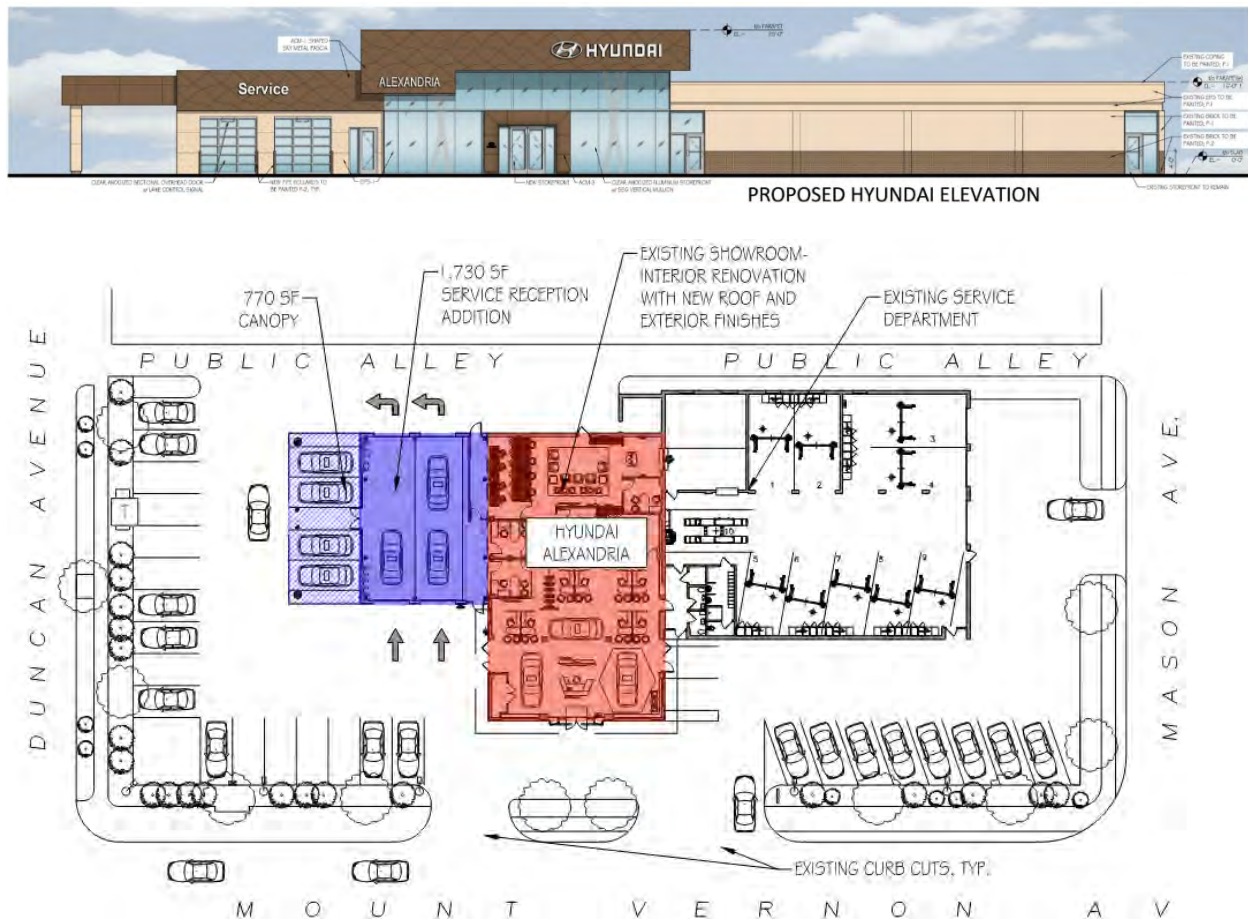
1707-1711 Mount Vernon Avenue proposed elevation and site plan changes noted in color
